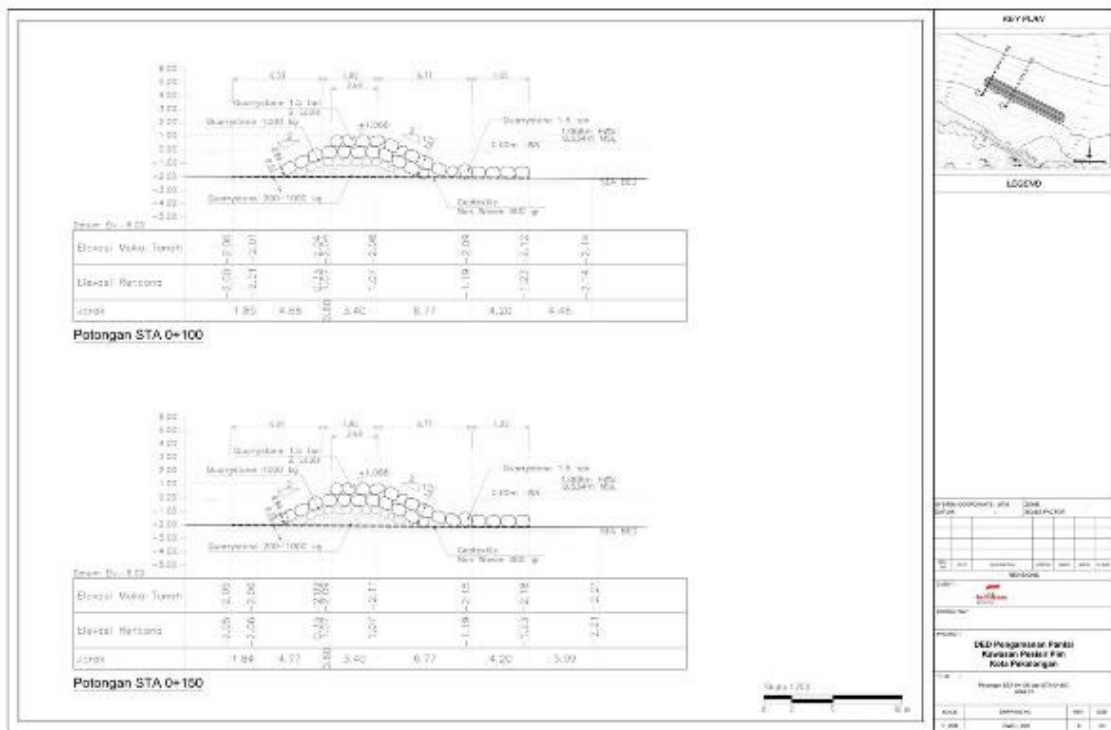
STA 0+100 Cross Section - STA 0+150 Area 1 Breakwater
